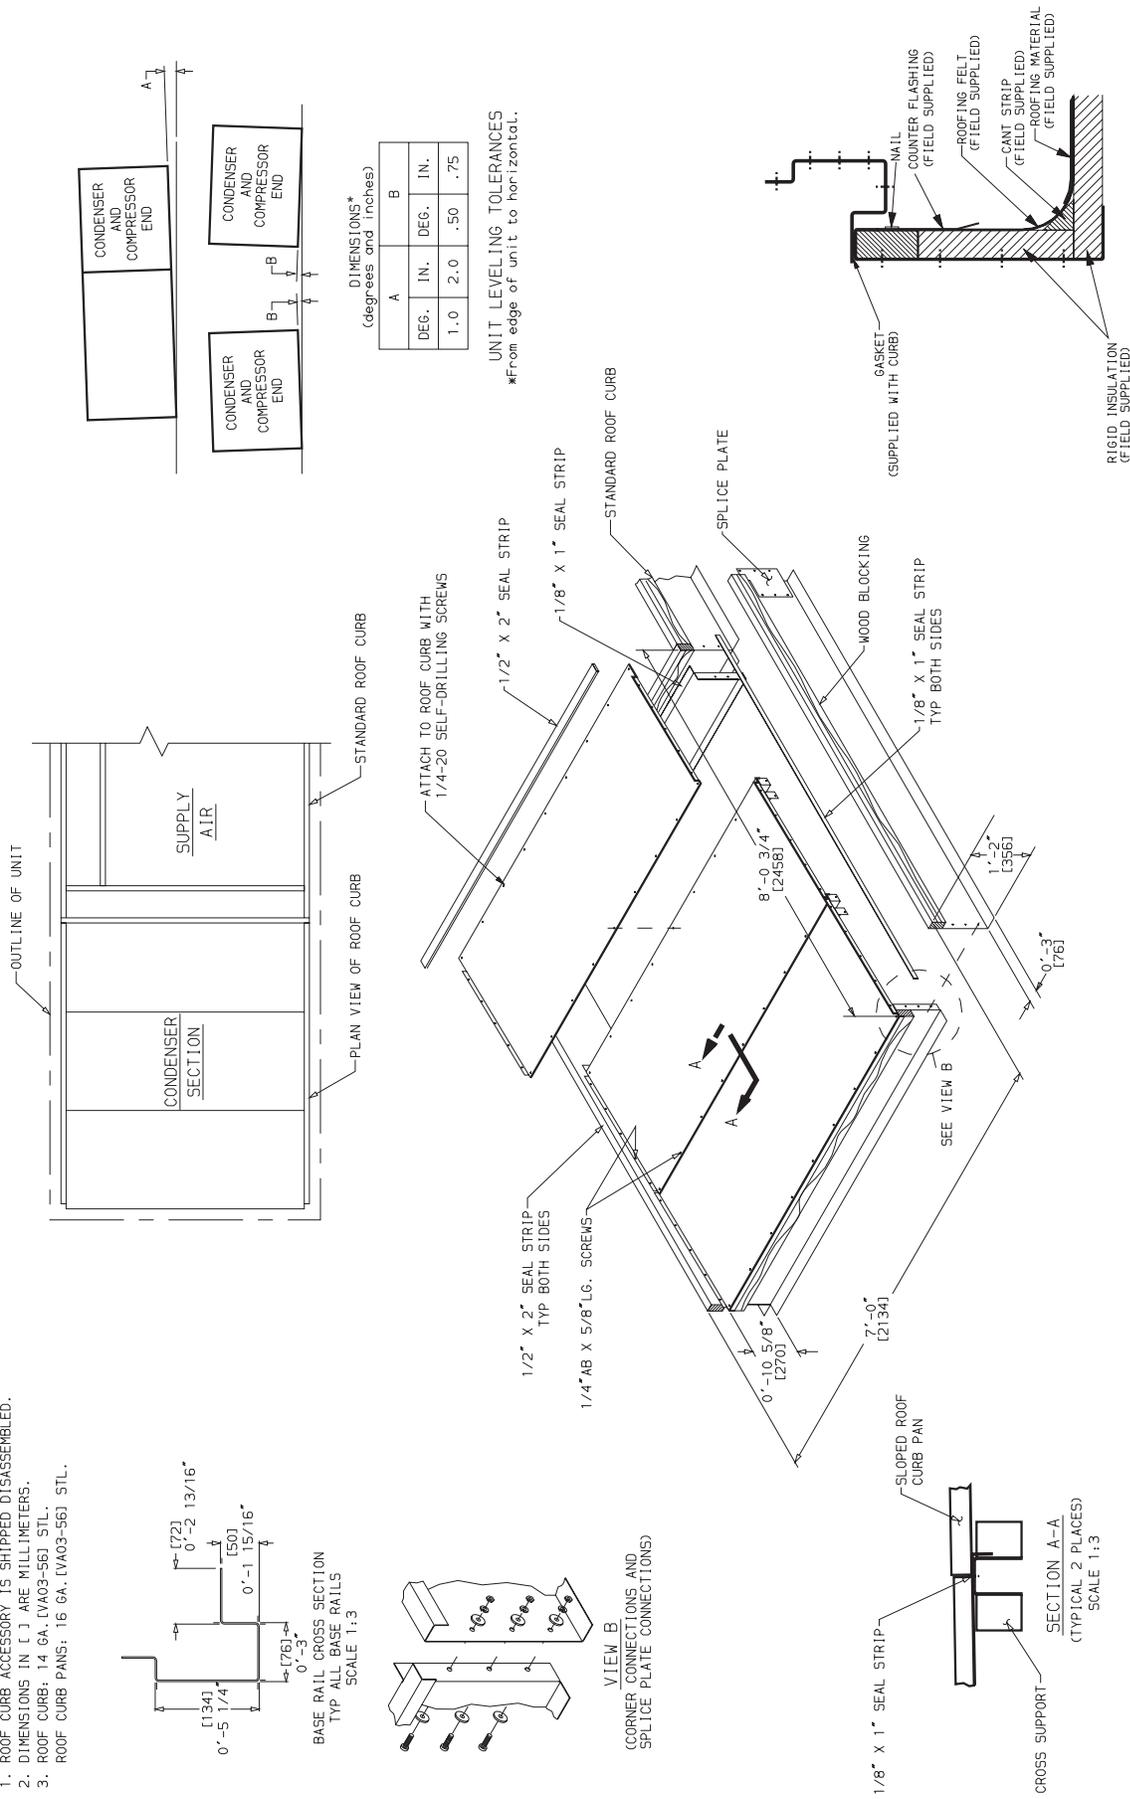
Condenser Section Roof Curb (Size 055 and 060 Only)
